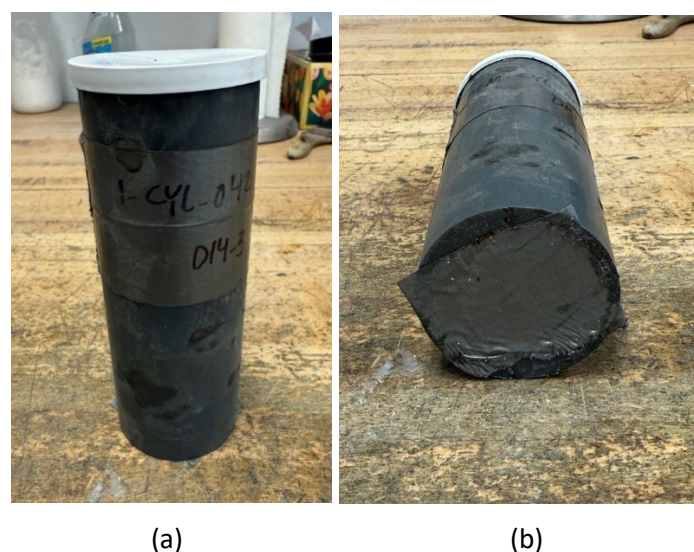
(a) Example of cylinder mould in vertical that displays the seam between the mould and collar; (b) Sealed with duct tape and bottom view that displays a 2 mm hole sealed with duct tape
